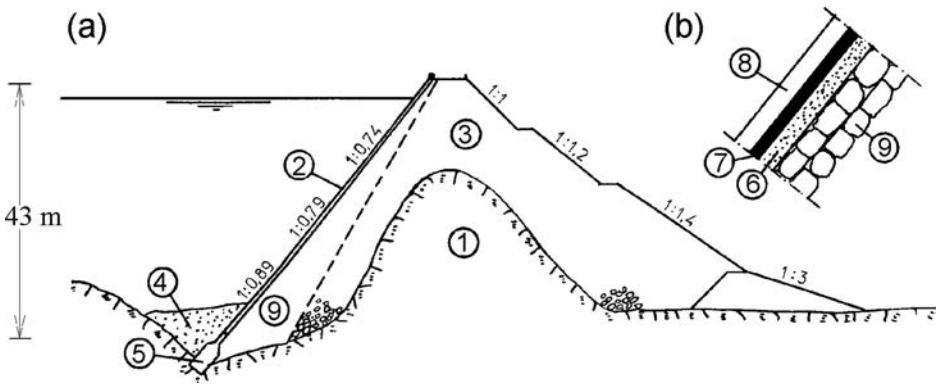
Radoyna dam, cross-section (a) and detail of facing (b). (1) Rock; (2) facing; (3) rockfill; (4) clay backfill; (5) concrete cutoff; (6) porous concrete; (7) asphaltic concrete  $2 \times 4.5$  cm; (8) reinforced concrete 15 cm; (9) dry stone masonry.
